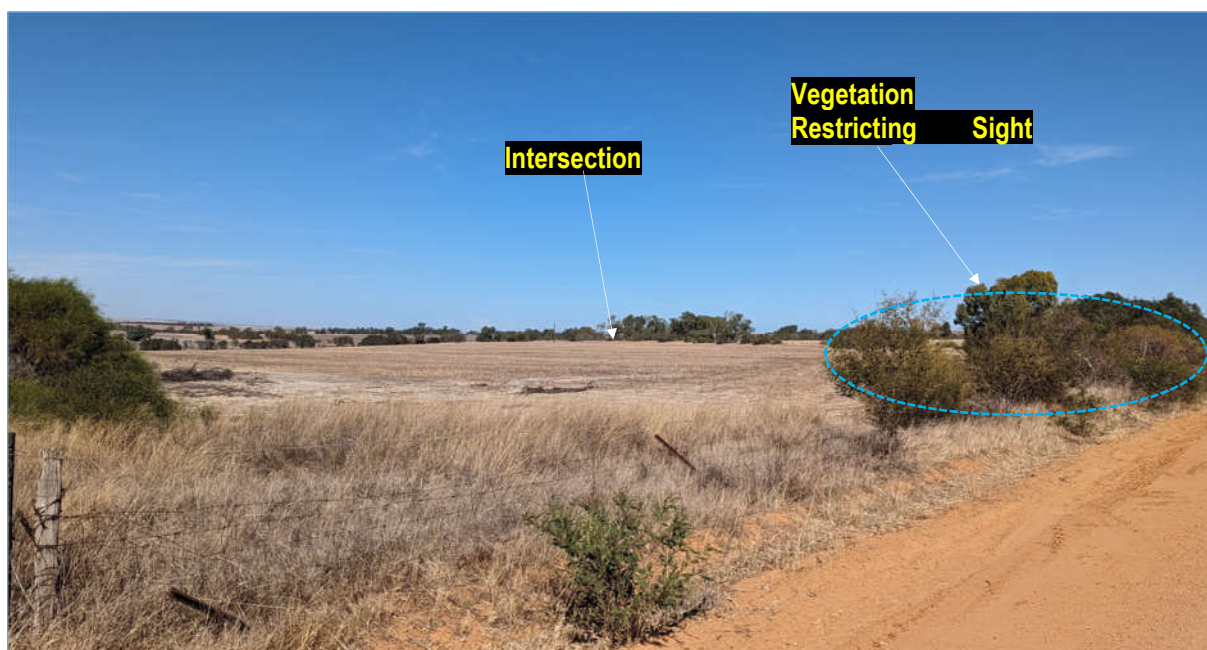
Strawberry NE Road Looking South to Site Access Intersection from 544m
